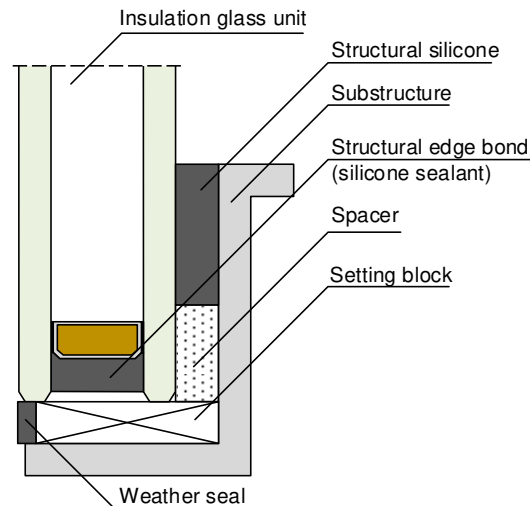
IGU with structural edge bond and adhesive connection to the building
